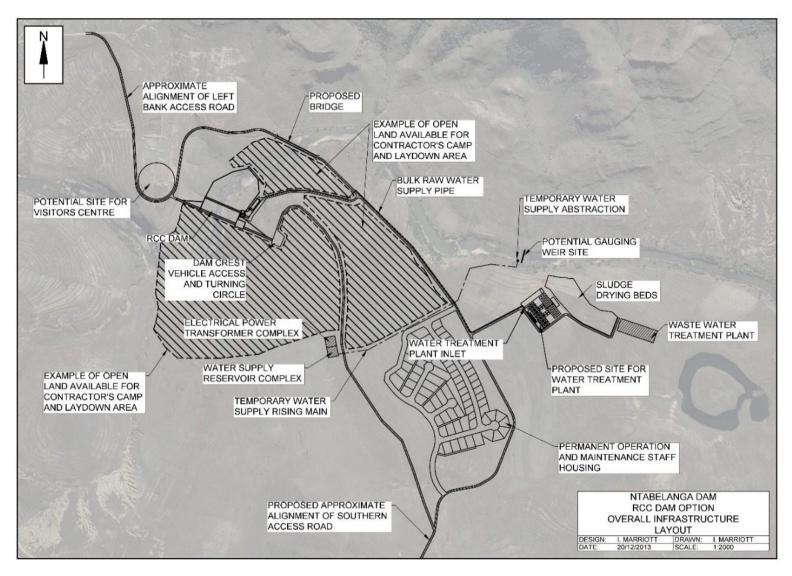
General Layout of the Proposed Dam and Associated Works
